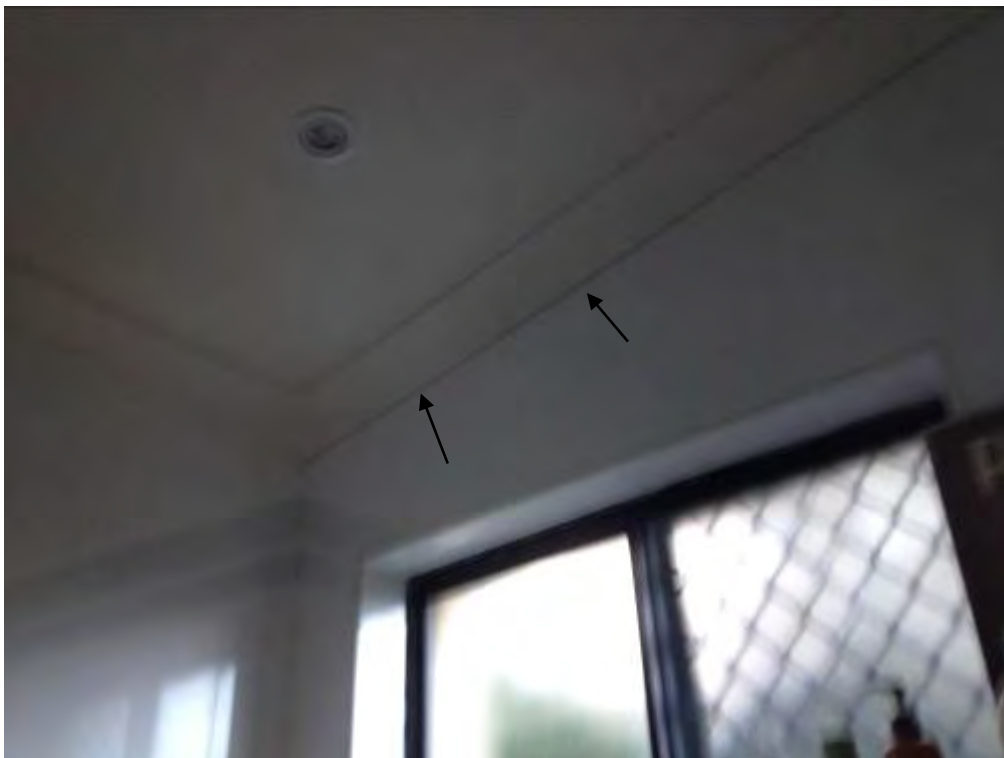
shows the location of the hairline vertical crack above the Lounge room window head
